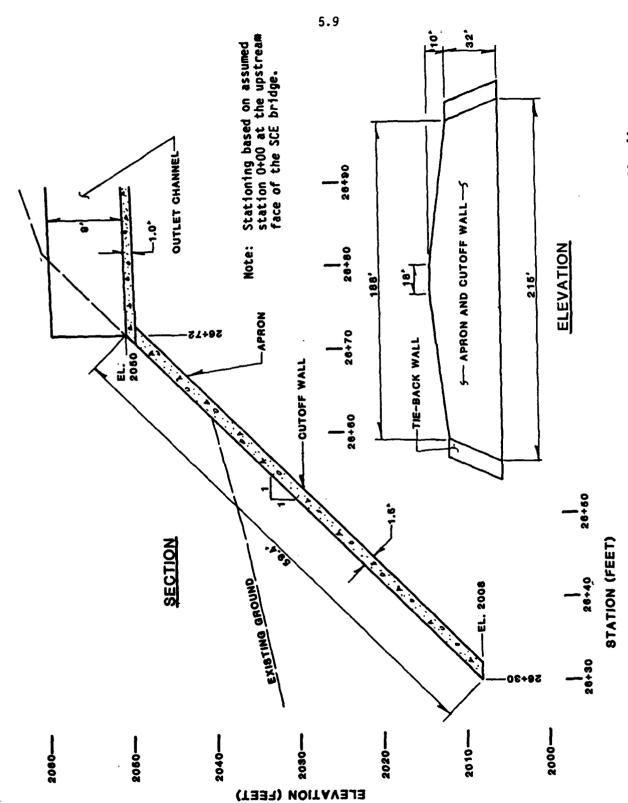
Section and elevation views of concrete apron and cutoff wall.
